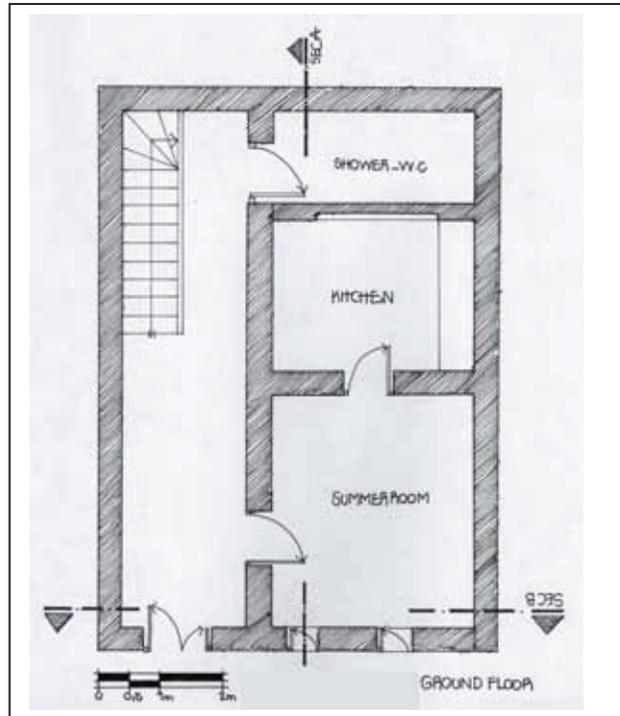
Ground floor plan of the Frāmarzis' house.
